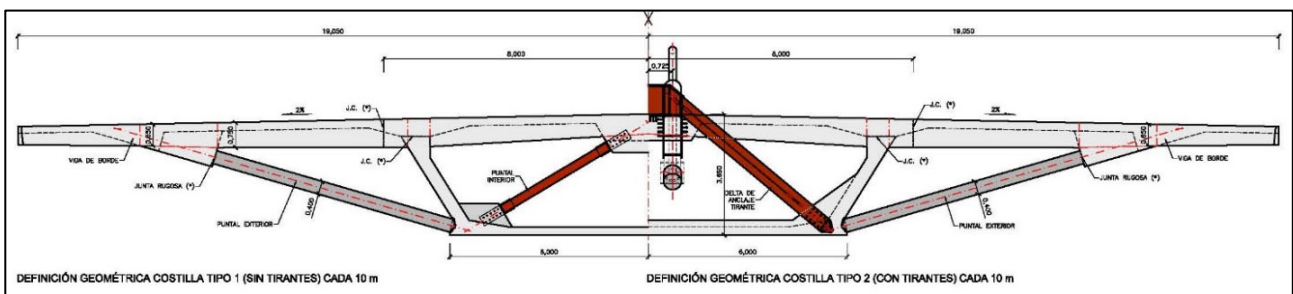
Deck cross section at a rib without cable anchors (left) and at a rib with cable anchors (right)
